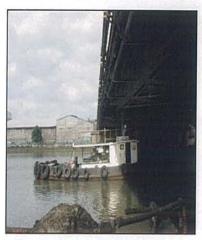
Measurement of Below Deck Level Using Tugboat
